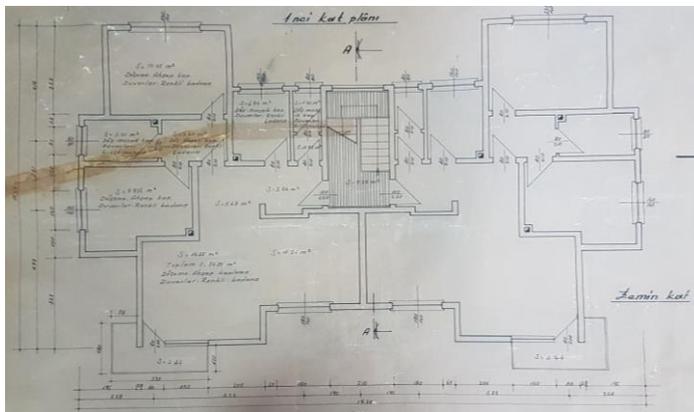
The ground floor plan drawing of the four-family apartment (Source: TTK Archive, 2020)
